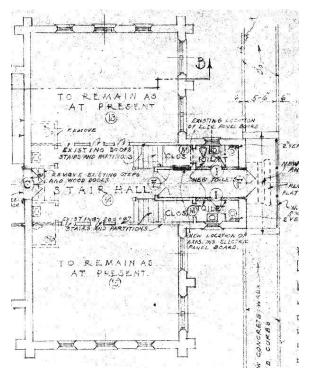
, Fredericksburg Courthouse, Detail, South wing, first floor. J. Binford Walford & O. Pendleton Wright, Renovation drawings, 1948. Courtesy City of Fredericksburg.
